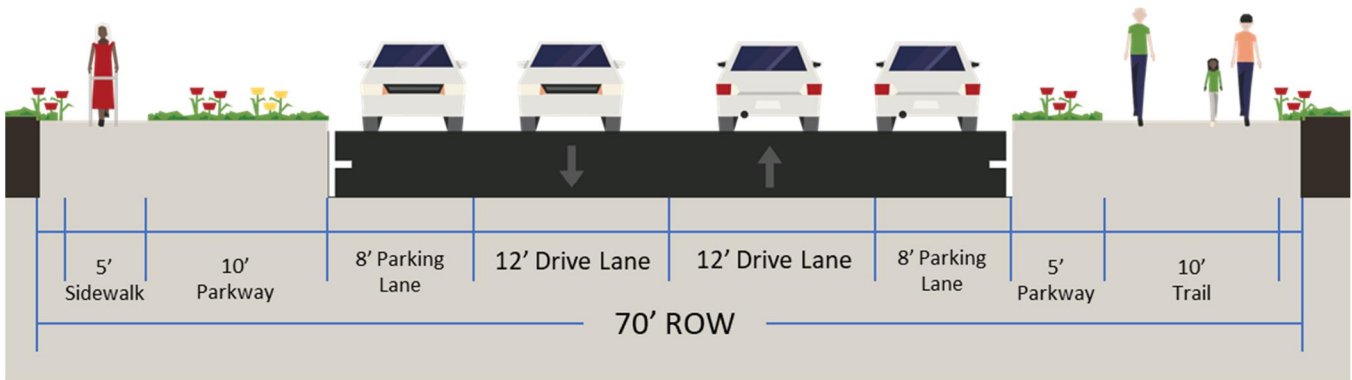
Proposed Cross Section: 2-Lane Undivided Collector (On-Street Parking) – Sidewalk vs. Trail Option
